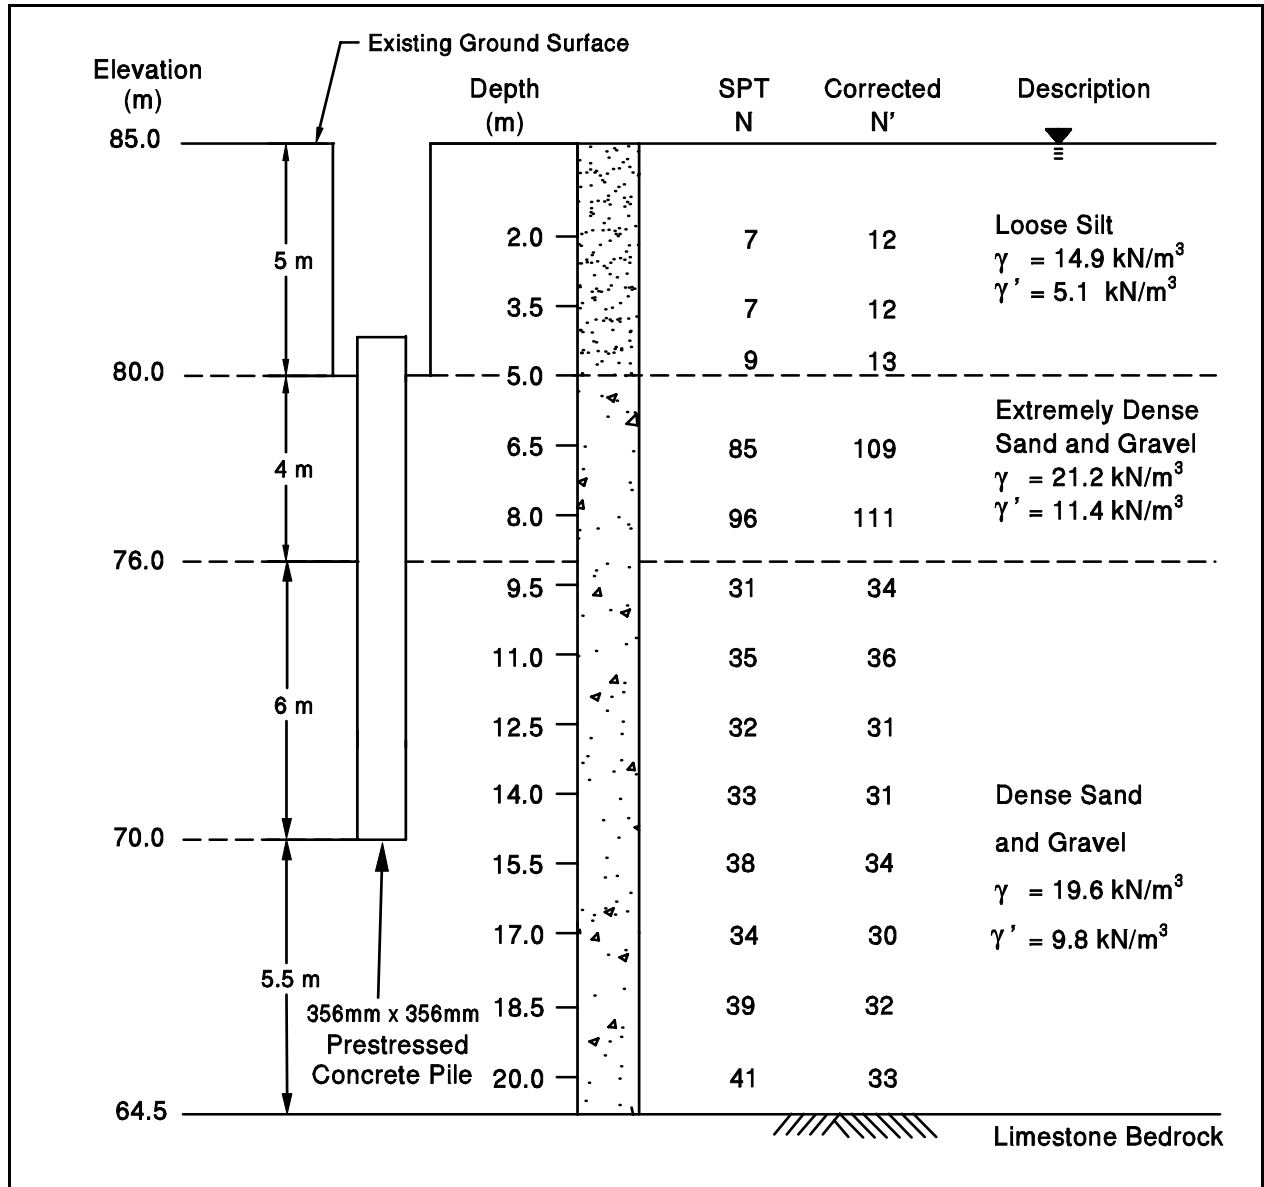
Interpreted Soil Profile from Soil Boring S-2 at Pier 2
